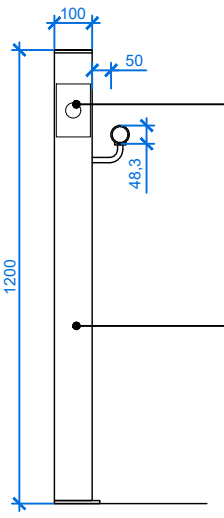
BALUSTRADE AND HANDRAIL SIDE ELEVATION
